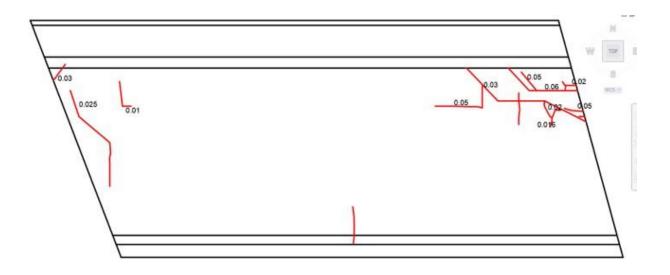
Bridge B40-336 crack map before overlay replacement (crack widths in inches noted next to each crack).
